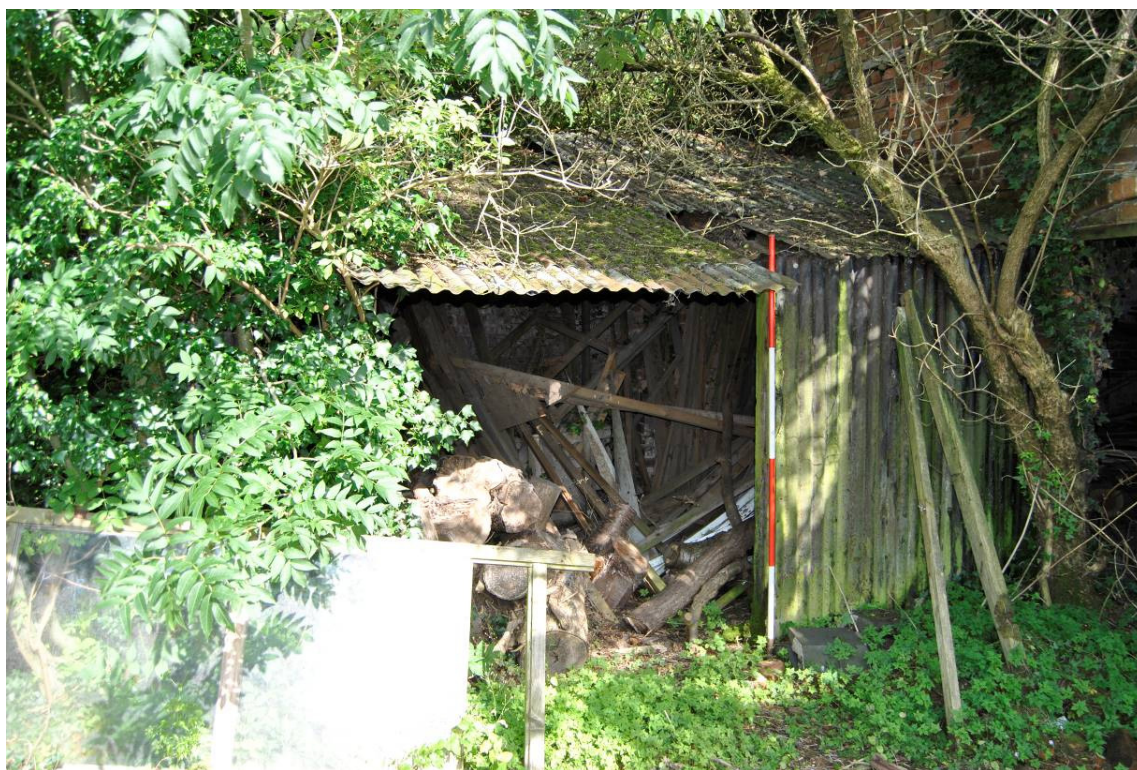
Timber and corrugated-iron lean-to wood store abutting north elevation of Garden Barn.
